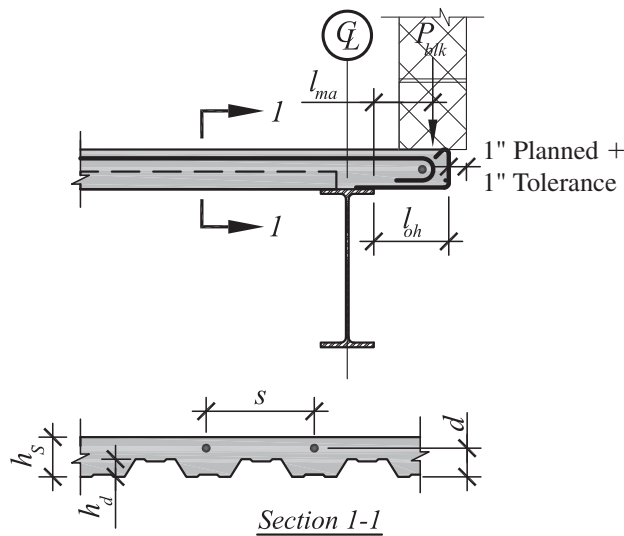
Spandrel beam detail when deck is perpendicular.
